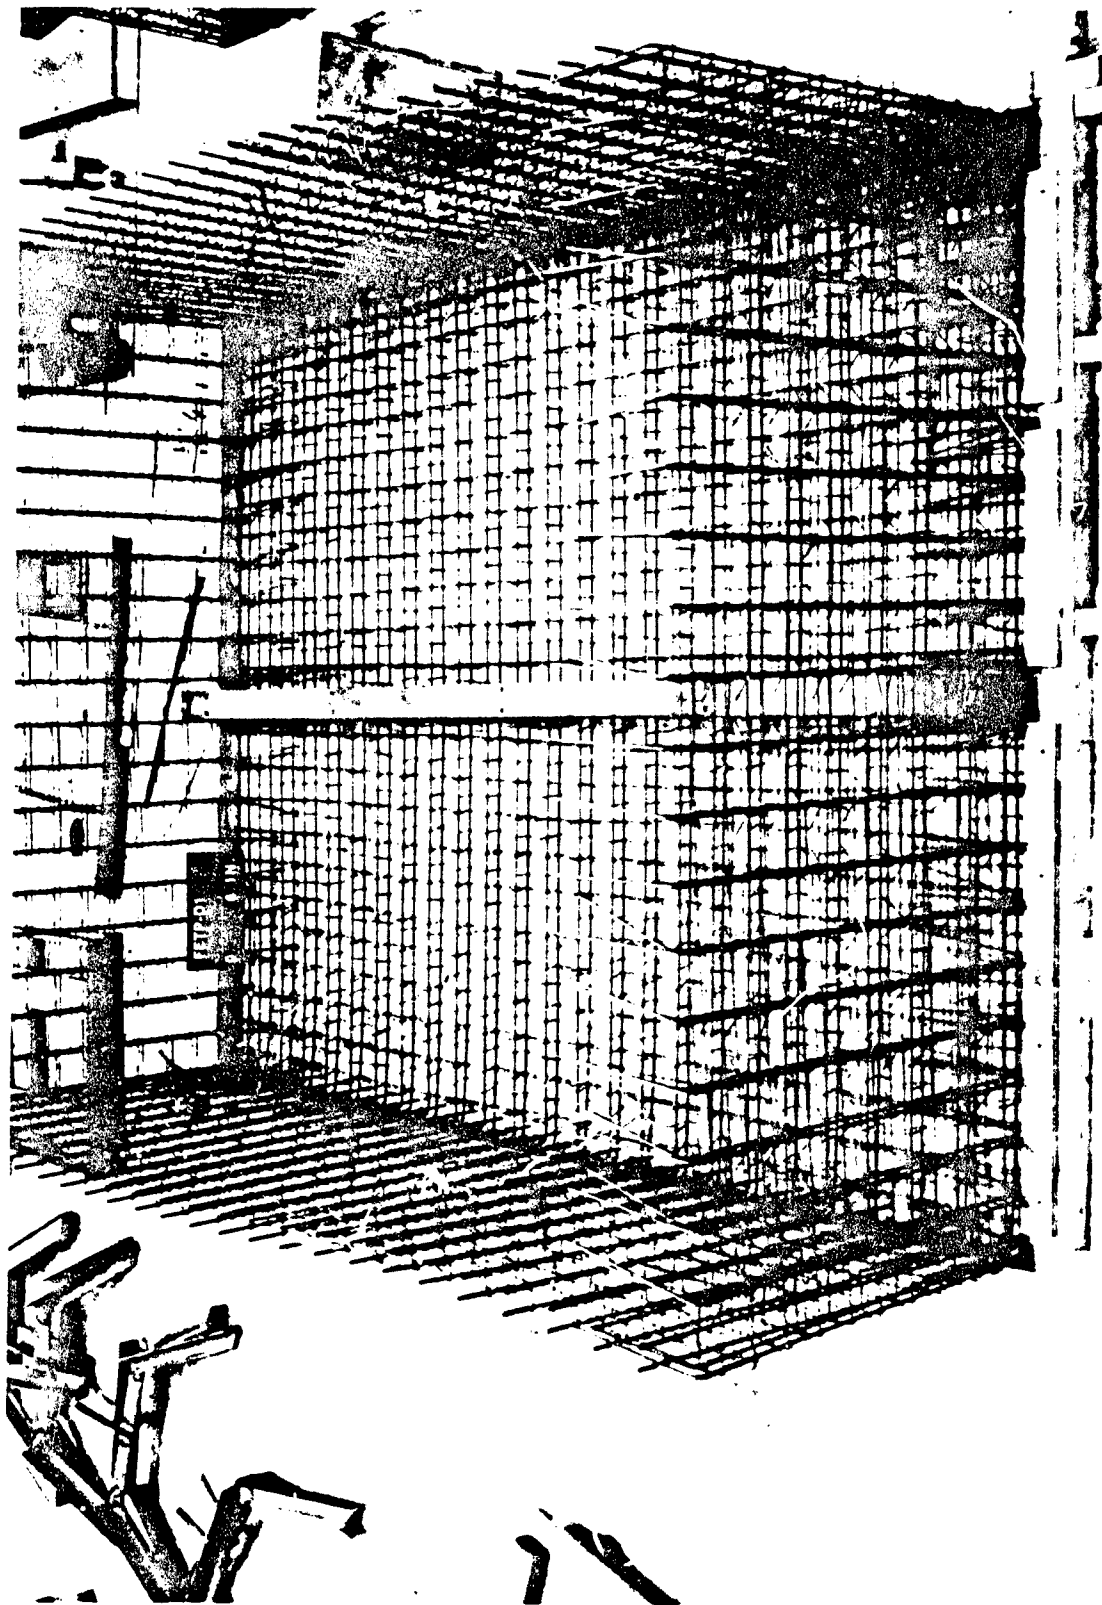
Placement of steel before pouring the Type 1 element floor slab.
